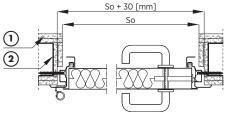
Installation of a single-leaf door with a corner frame to a masonry wall – horizontal cross-section
